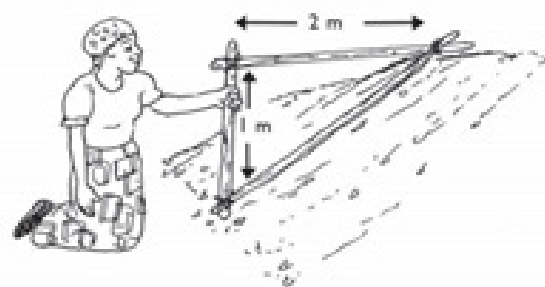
shaping inside pond slopes Fig 3.22 levelling and slopping the pond dykes
